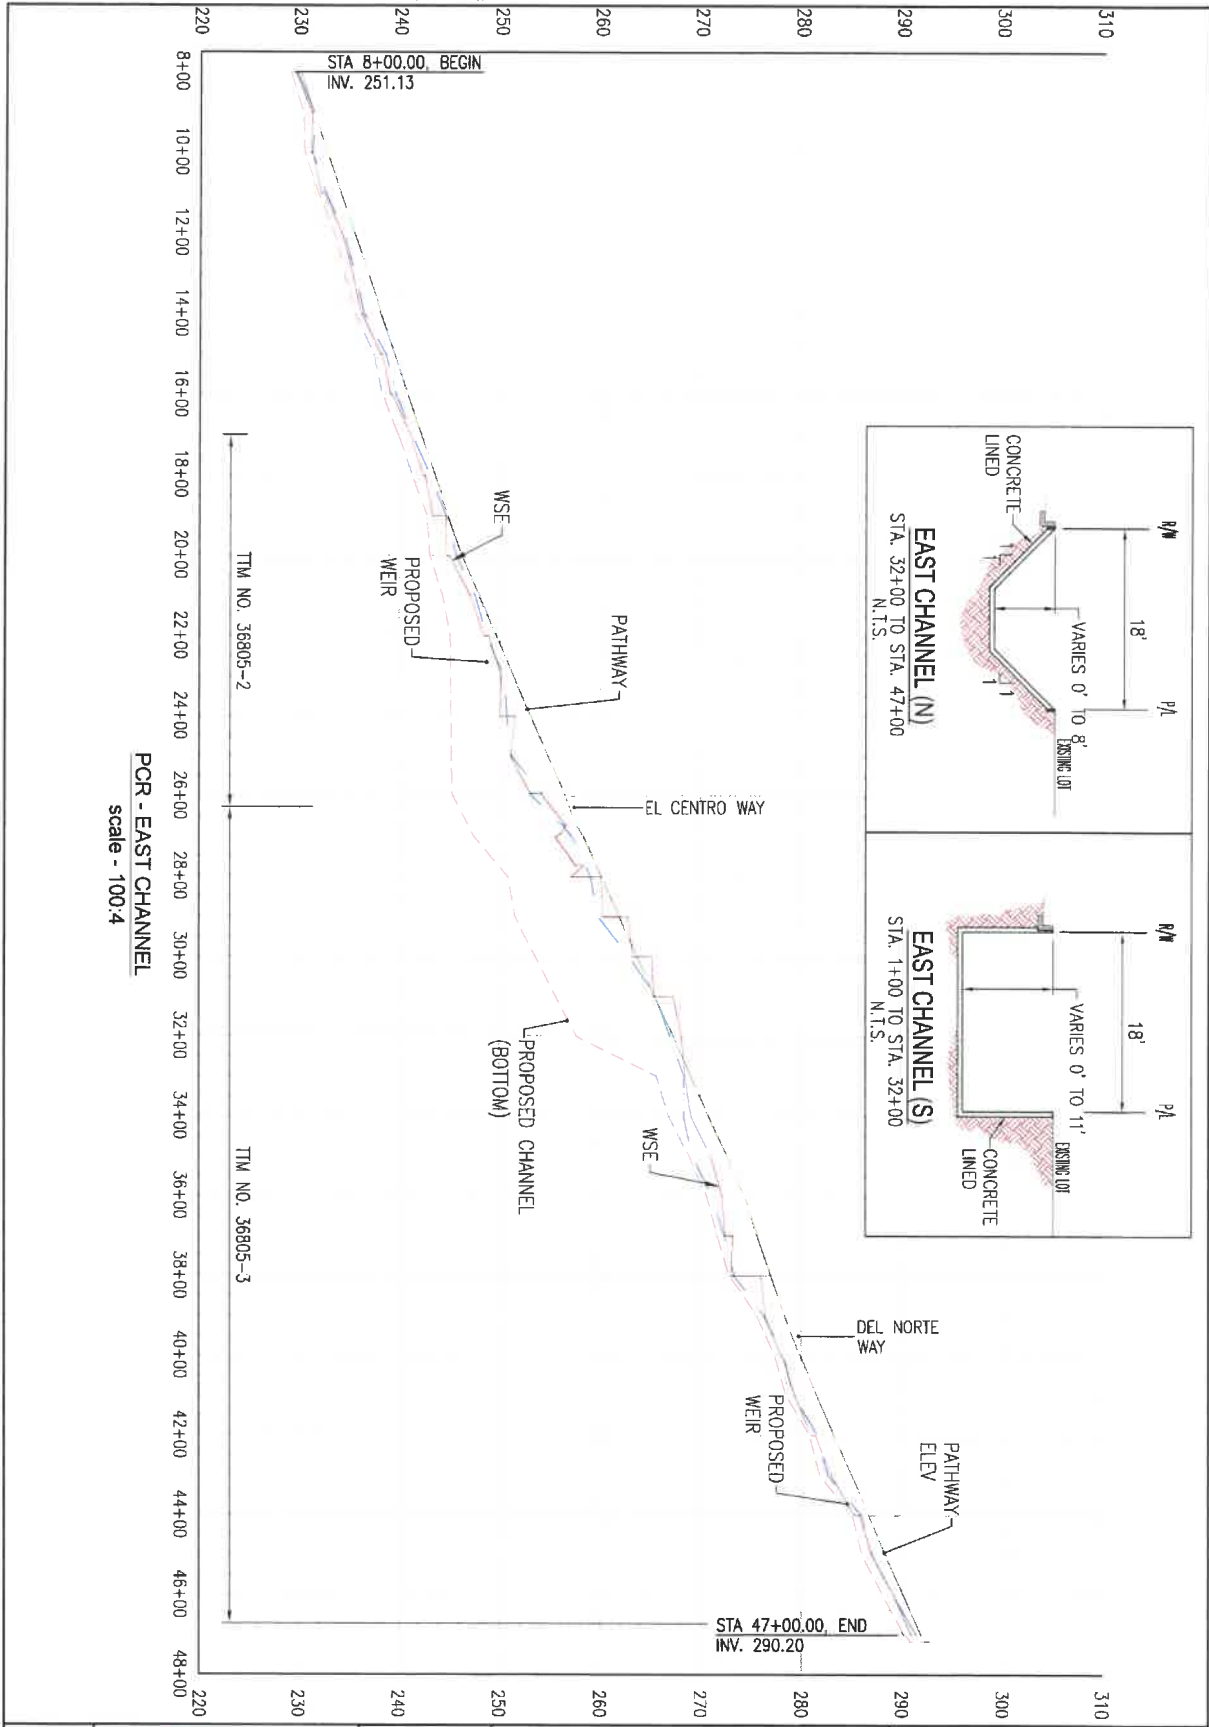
EXHIBIT F	 PACE Advanced Water Engineering 17520 Newhope Street, Suite 200 Fountain Valley, CA 92708 P: (714) 481-7300 www.pacewater.com	SCALE AS SHOWN DESIGNED B.M.P. DRAWN A.E. CHECKED DATE 9/26/17 JOB NO. A591	JOB PALM CREEK RANCH FLOOD HAZARD IMPACTS	TITLE CHANNEL / CULVERT PROFILES
